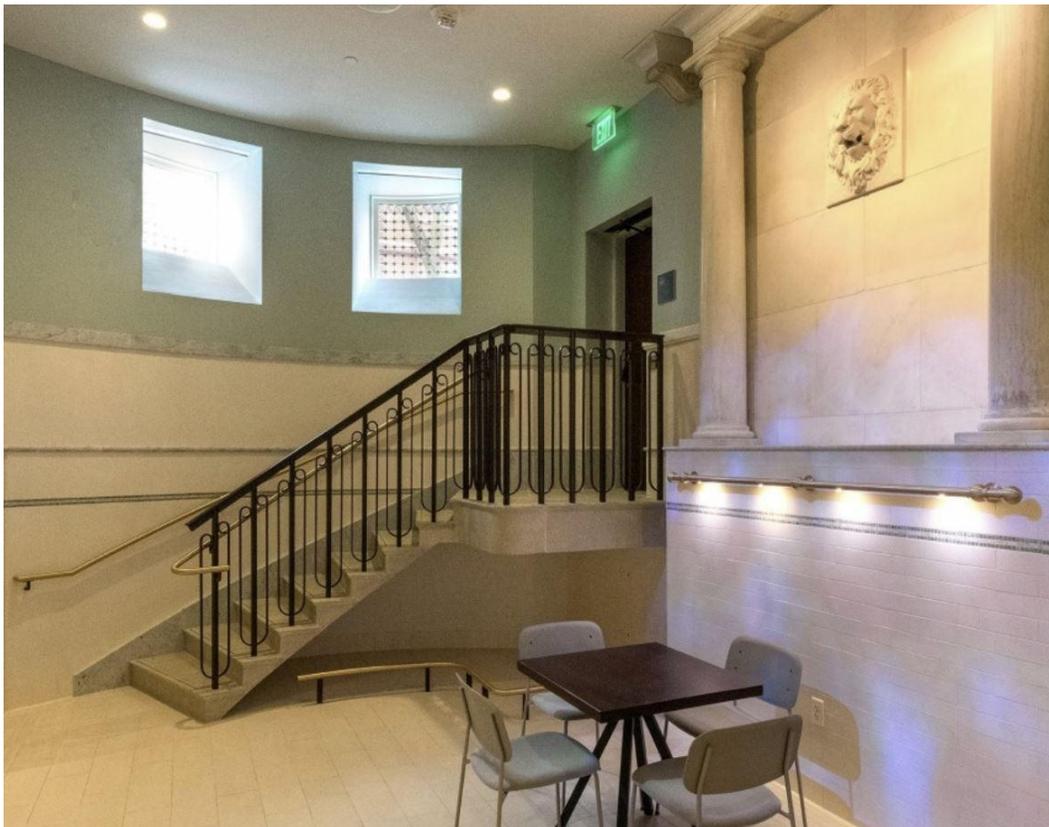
A curved, cantilevered, precast concrete stair that was designed by CVM that leads into a new study area for students. This stair is mimicked from stone cantilevered stairs that have been constructed since the 1600's.
